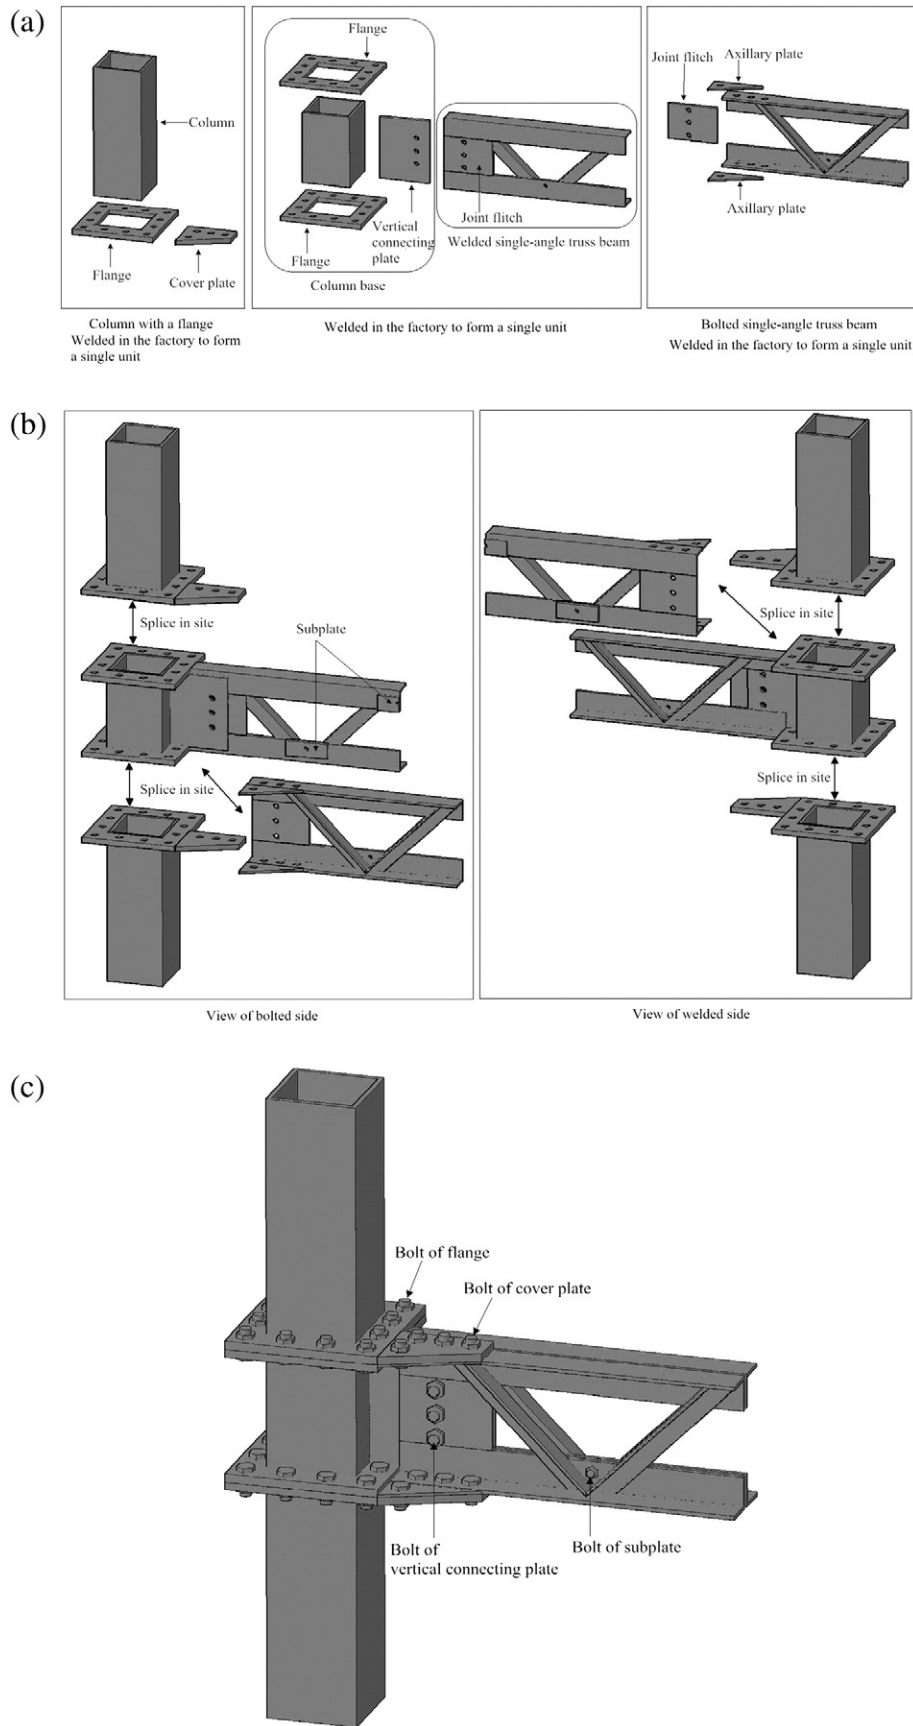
Structural diagram of the joint. (a) Exploded view of components. (b) Assembly drawing. (c) Assembled joint.
